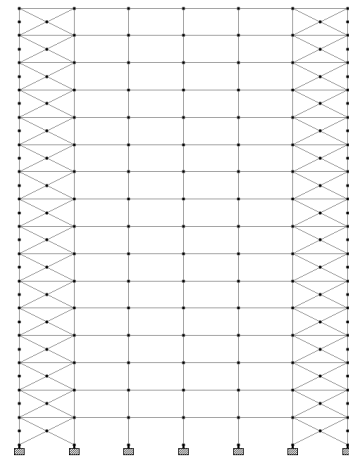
Typical Elevation of 16 Storey Building with Cross Bracing
